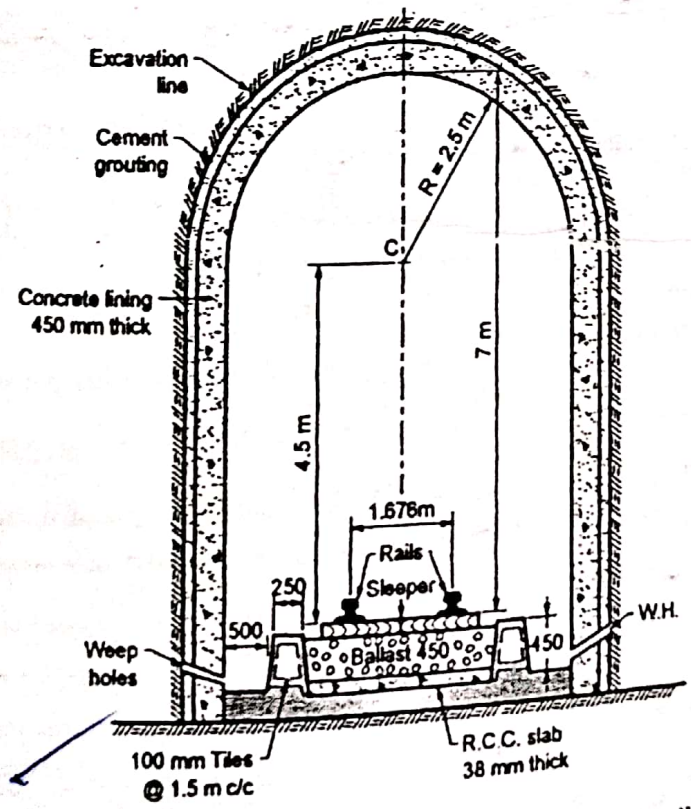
Cross-section of tunnel for a single line broad gauge railway track
